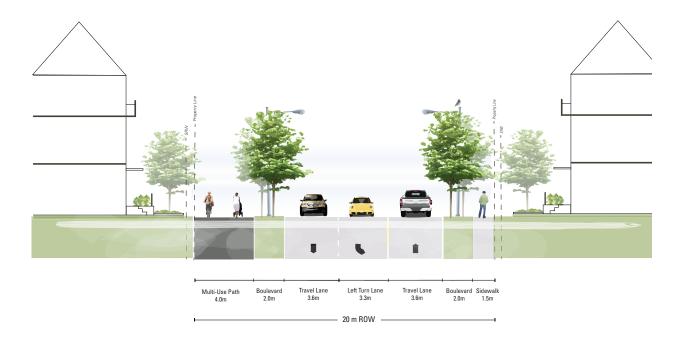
P: Standard Local Cross Section - 20 m Road Allowance
